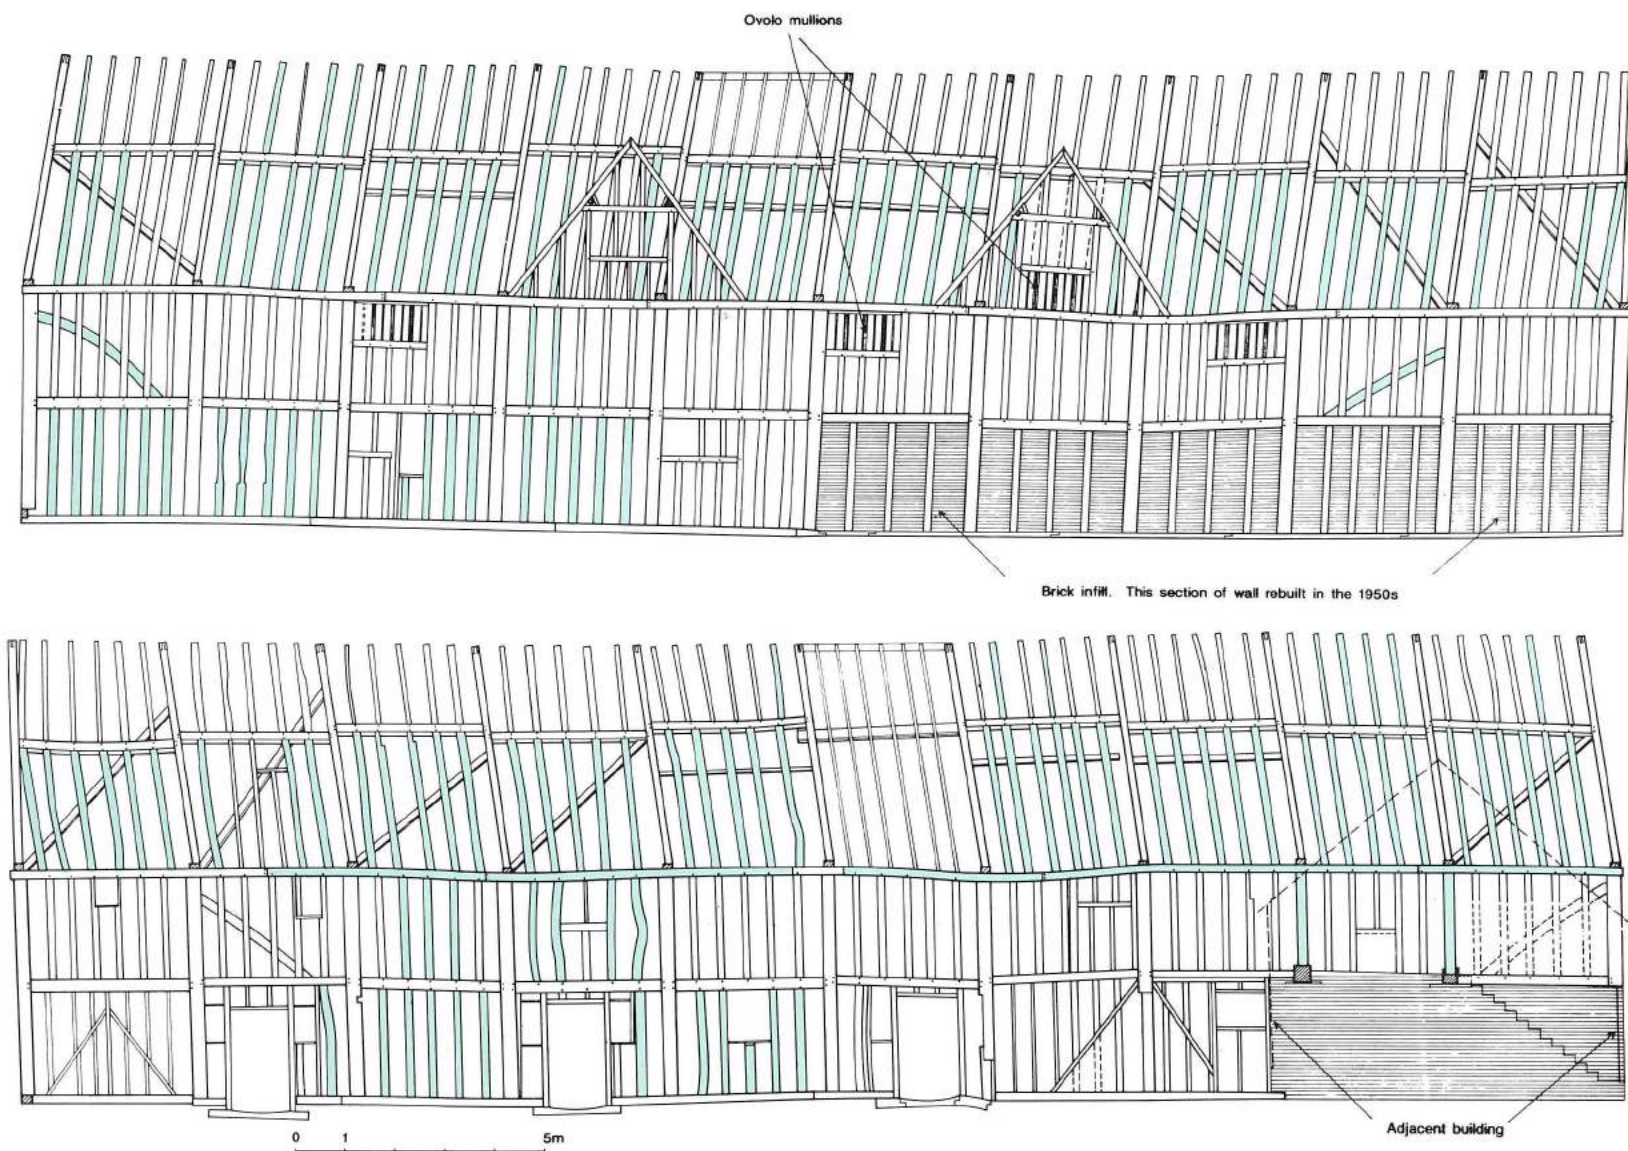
The Granary, east and west elevations (re-used timbers original to the 1623 construction shaded).
